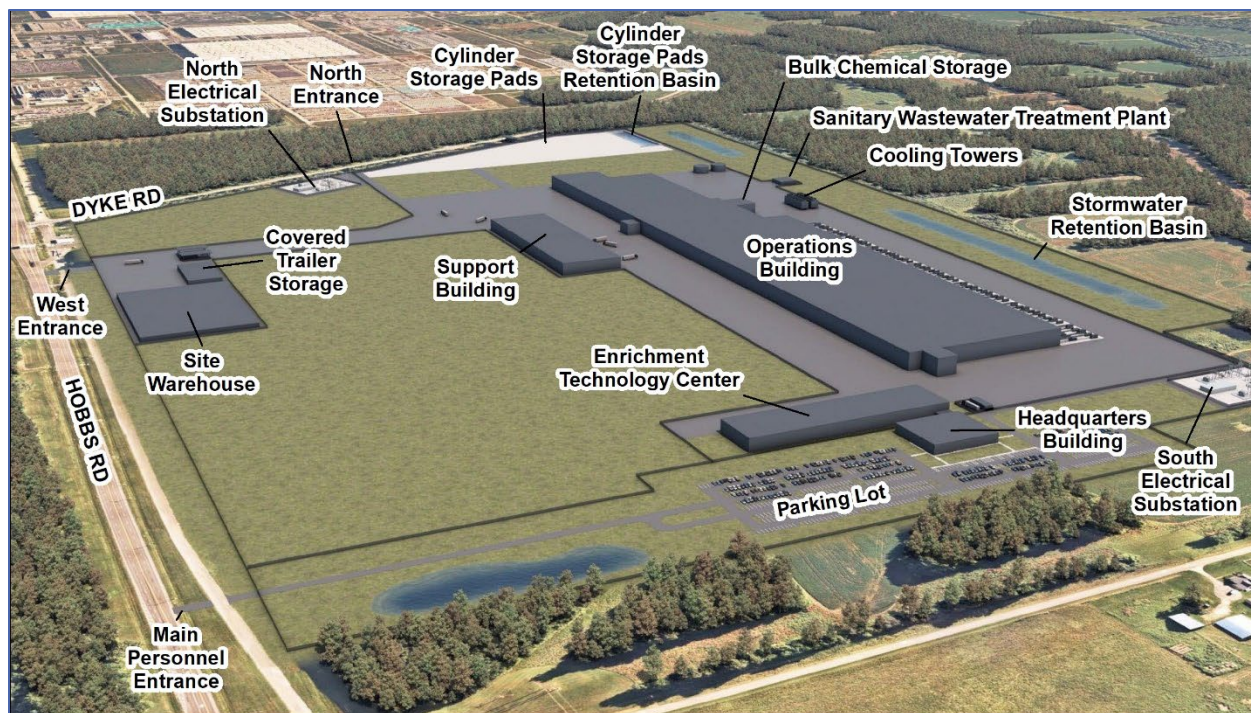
Proposed PLEF Conceptual Site Plan (modified from GLE 2025a).
